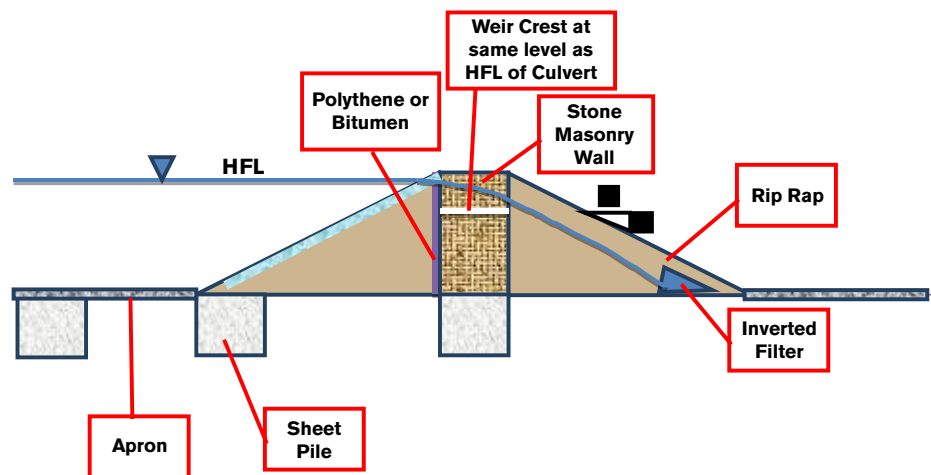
Possible Cross-Section of Bund at Gabion Wall Location
